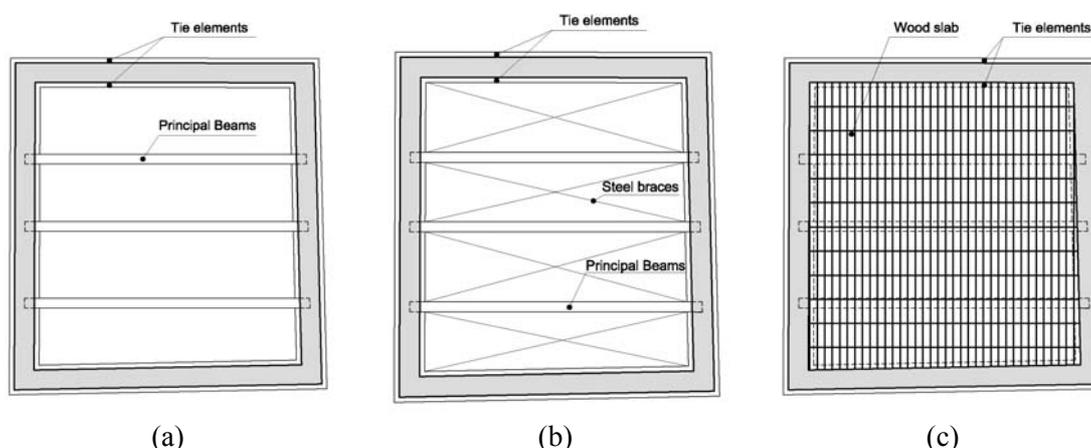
The different retrofit techniques: (a) connection of the wooden beams to the masonries; (b) bracing reinforcement of the timber slab; (c) insertion of a timber double crossed slab.
